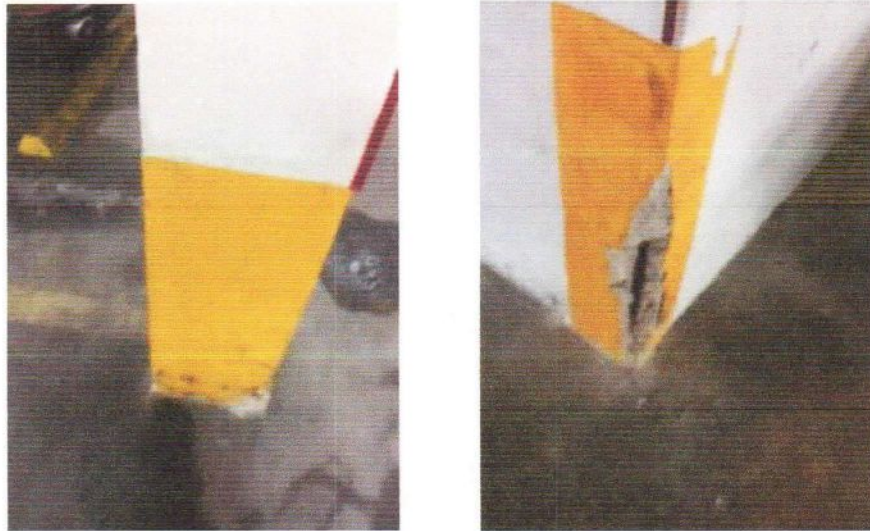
Typical cracking and spalling at parking garage columns
